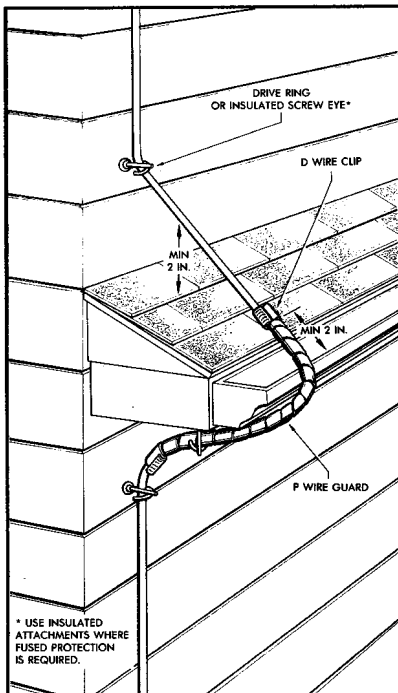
Drop Wire Crossing Building Overhangs and Gutters
